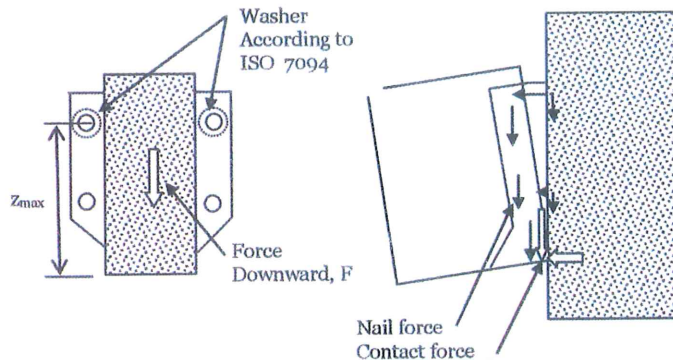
Left: Cross section in joist. Right: The joist will deflect and rotate, at the bottom a contact force will occur at the bottom plate, and the withdrawal forces in the bolts in the wall will vary linearly as assumed for nailed connections in the header.
